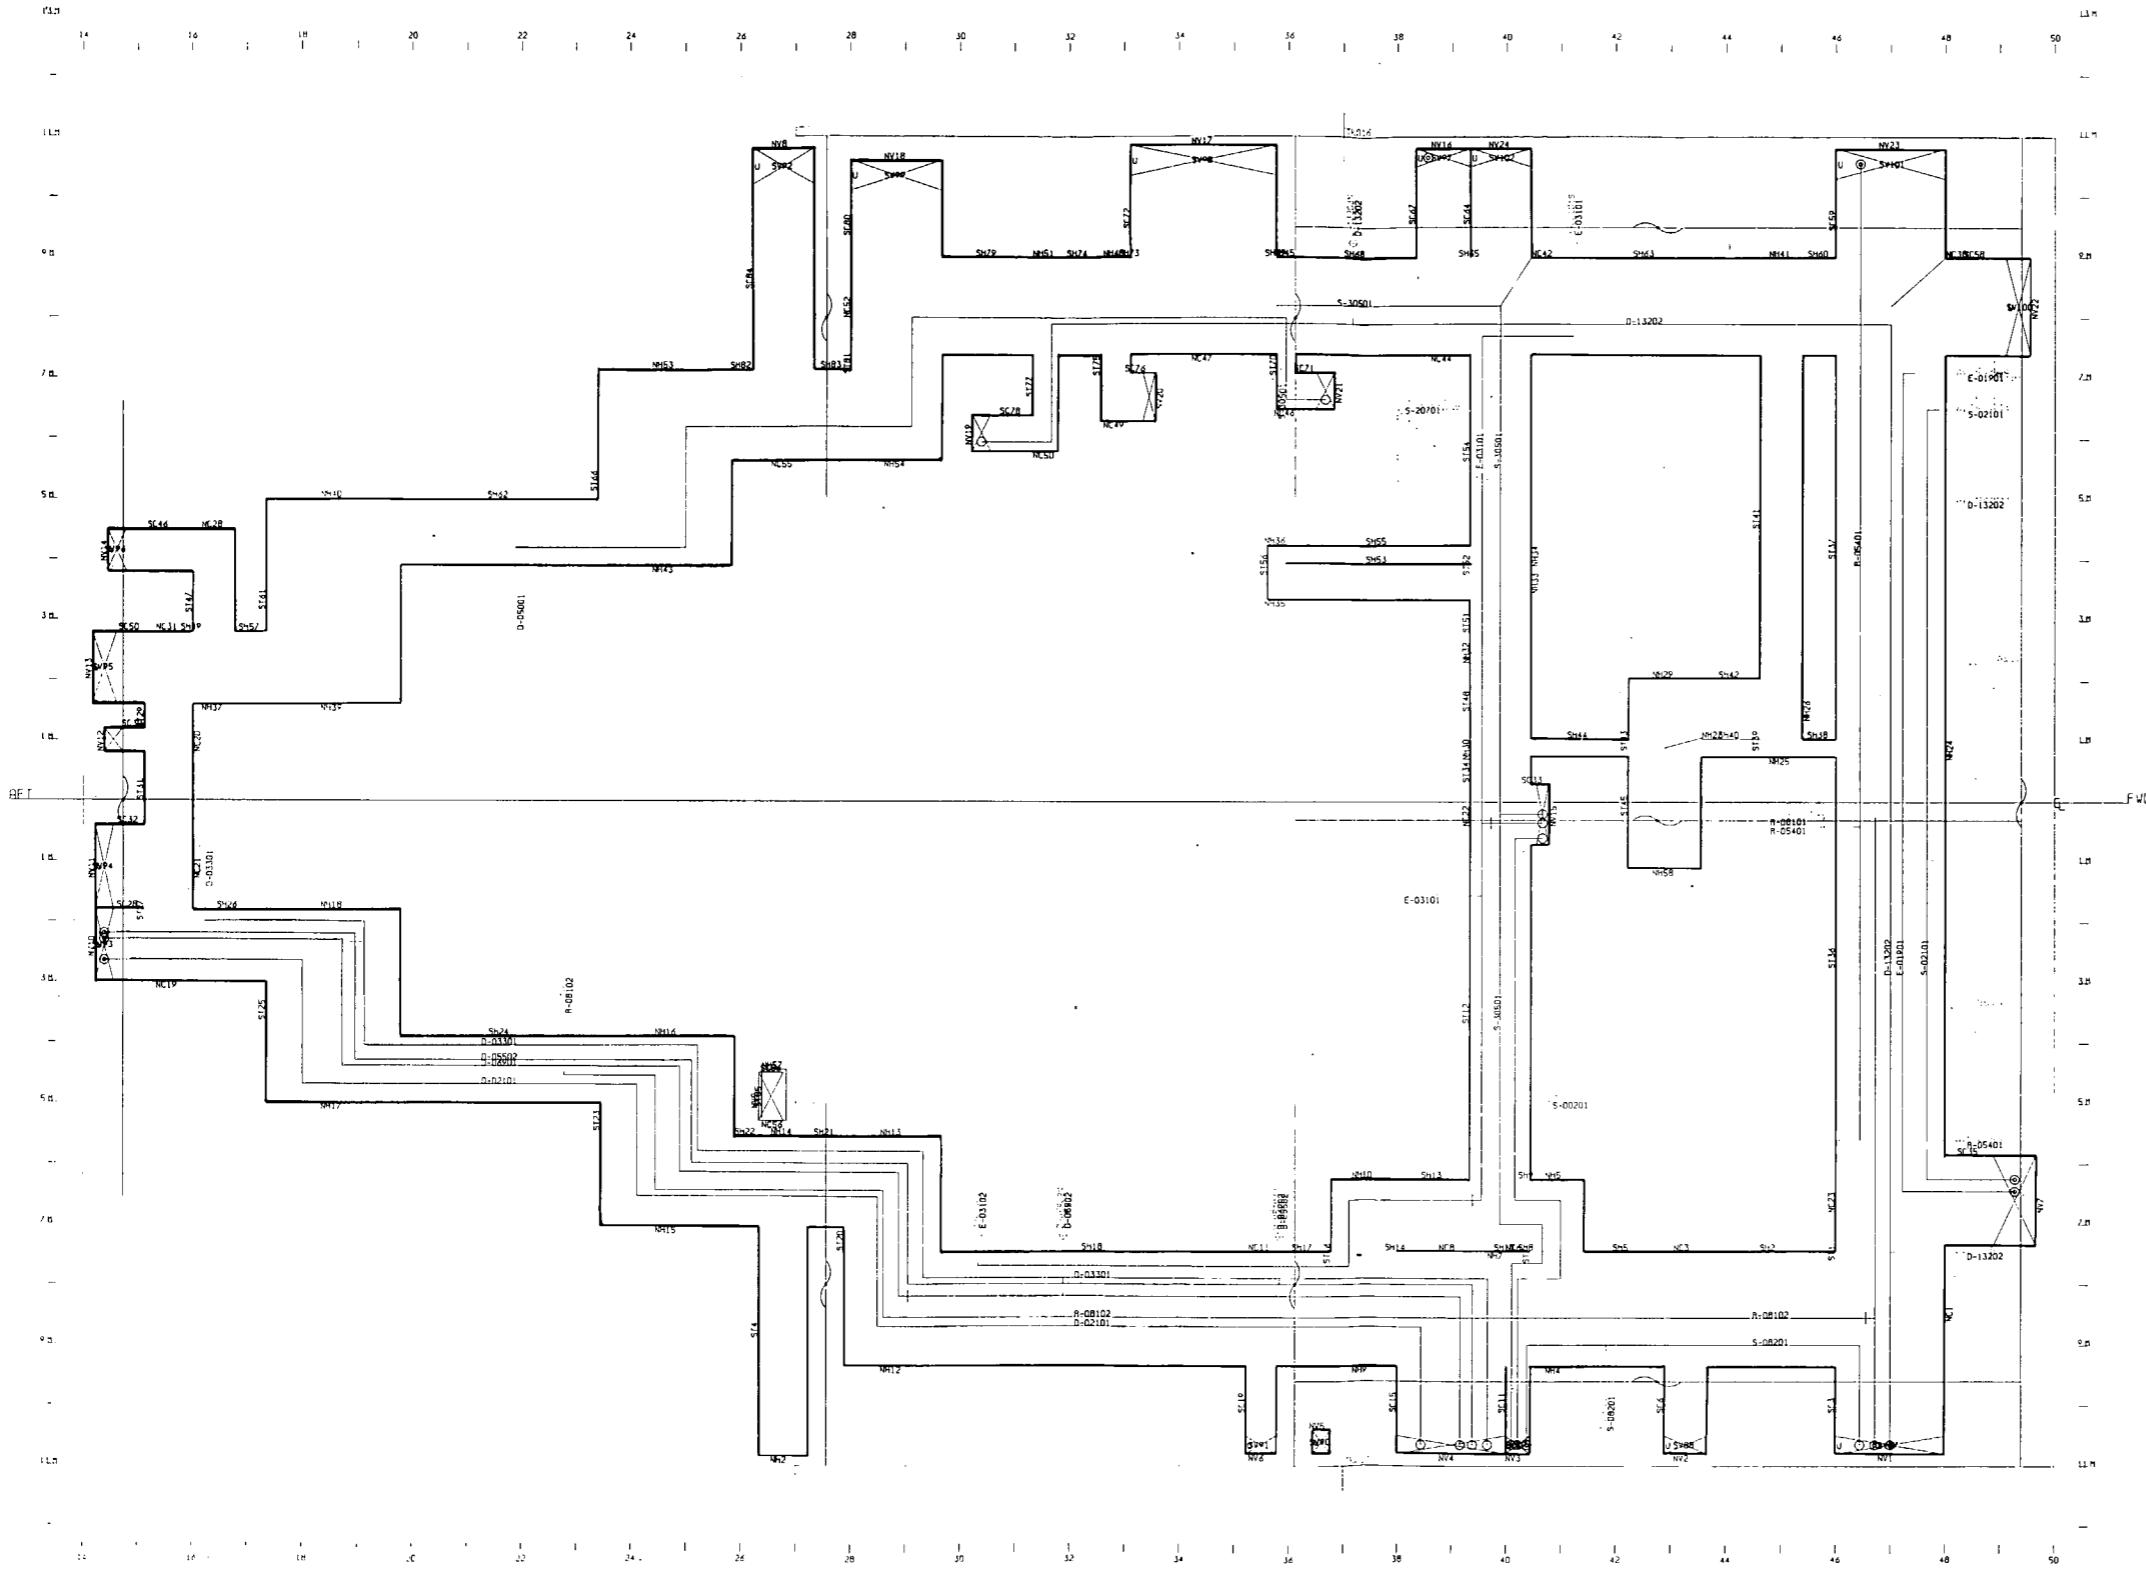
3RD DECK UNDER DECK PLAN IDAN HEIMEN ZU
